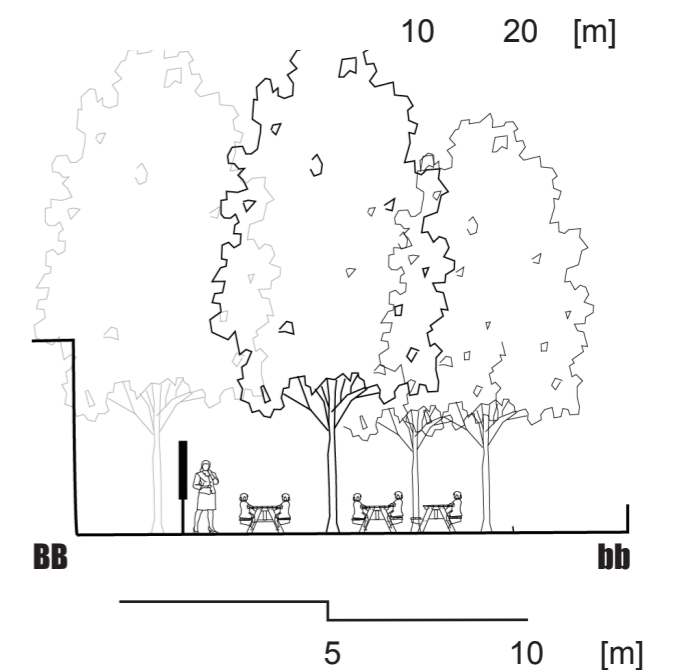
Conceptual section of the outdoor classroom in *The Classroom* area, illustrating the spatial layout. Scale 1:200
